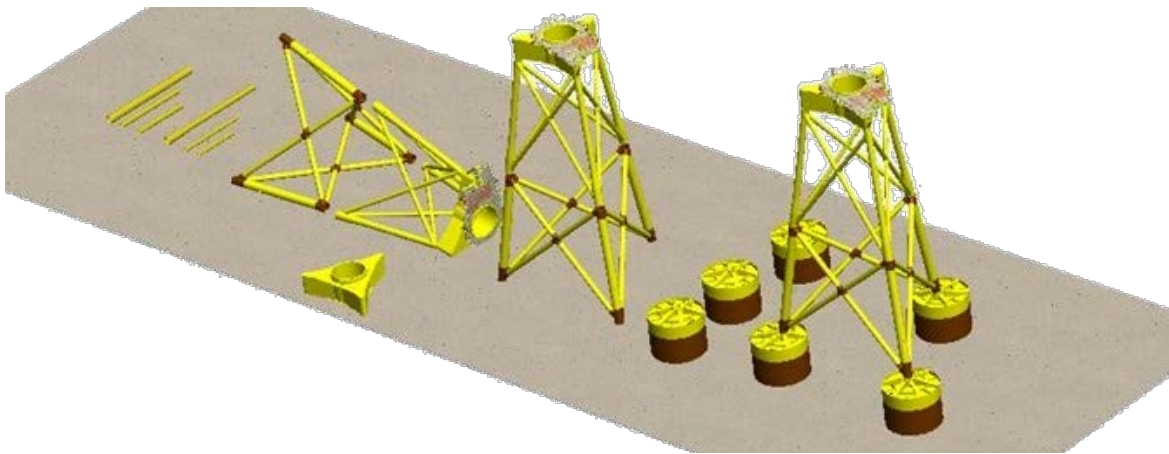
Dong Energy's SBJ foundation assembled as building blocks. How and when to install strain gauges required thorough planning and cooperation with the Yard (Source NGI archives)
